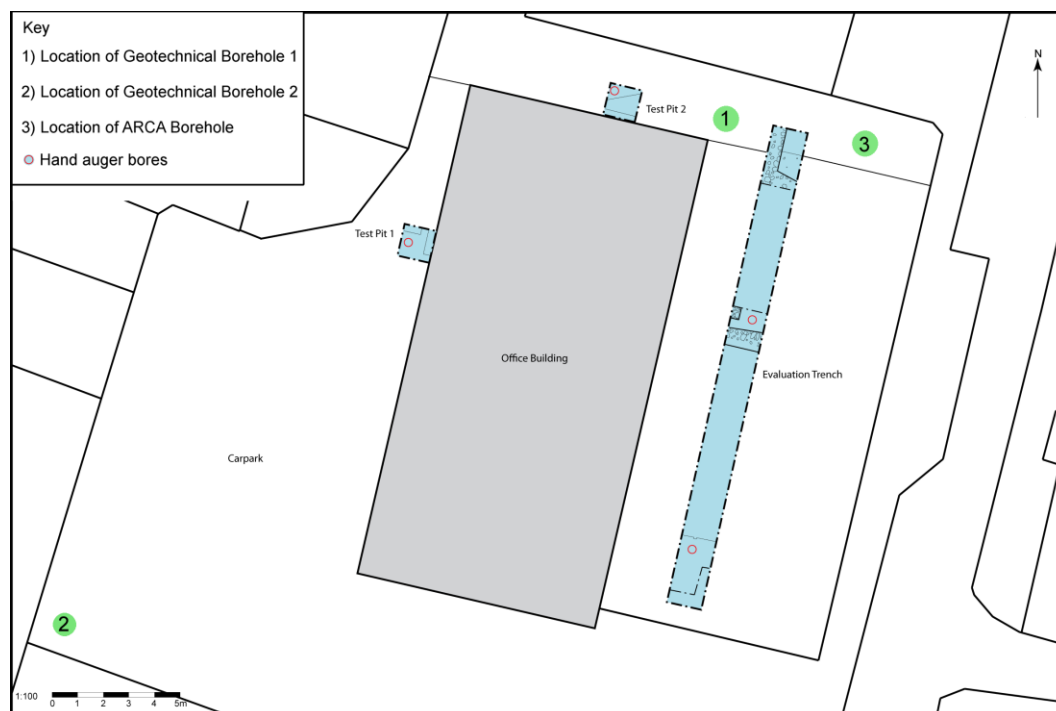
Plan showing location of geotechnical boreholes observed and hand auger bores undertaken by ARCA
